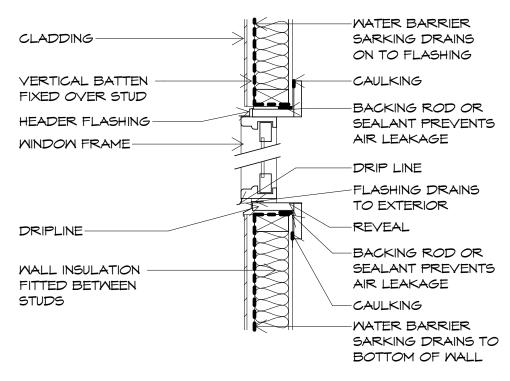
SARKING UNDER BATTENS & VENTILATION
